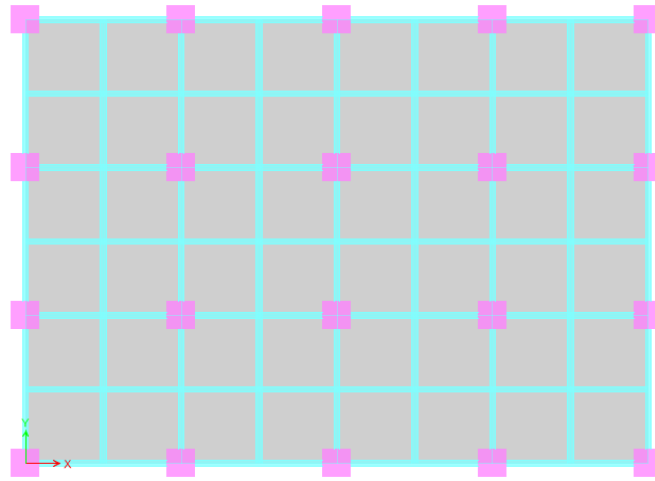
2D plan of 8th story rectangular shape building case SW1
